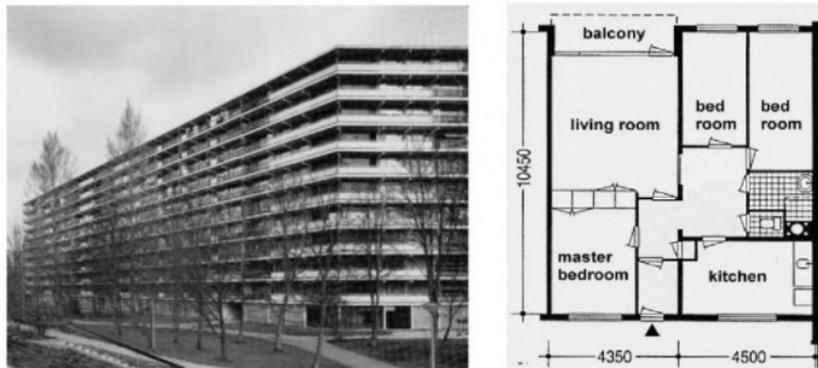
Typical facade (left) and floor plan (right) of post-war high-rise building blocks from the sixties (Andeweg & Koopman, 2007).
